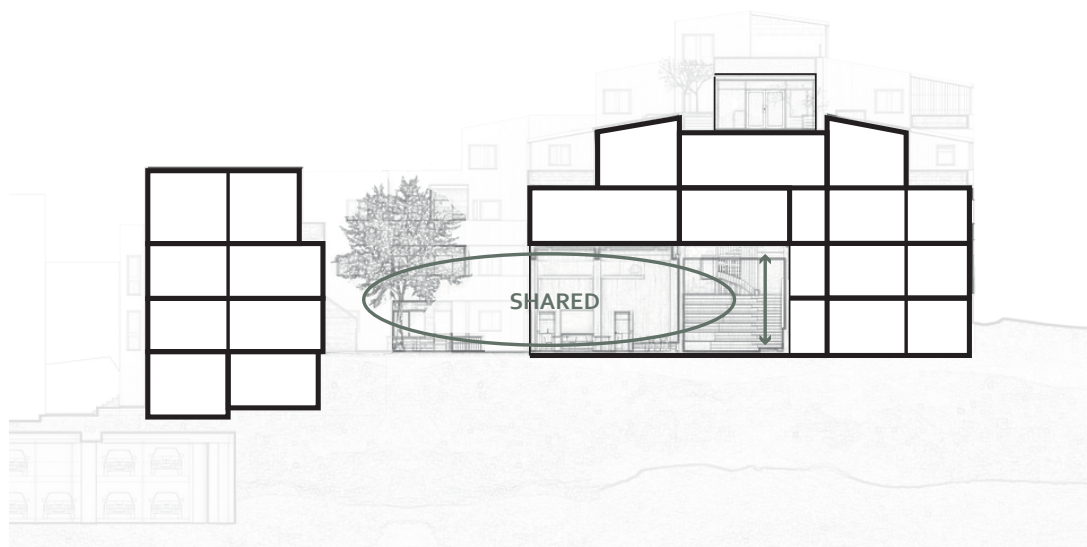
Vertical connections gallery (ArchDaily, 2021)
